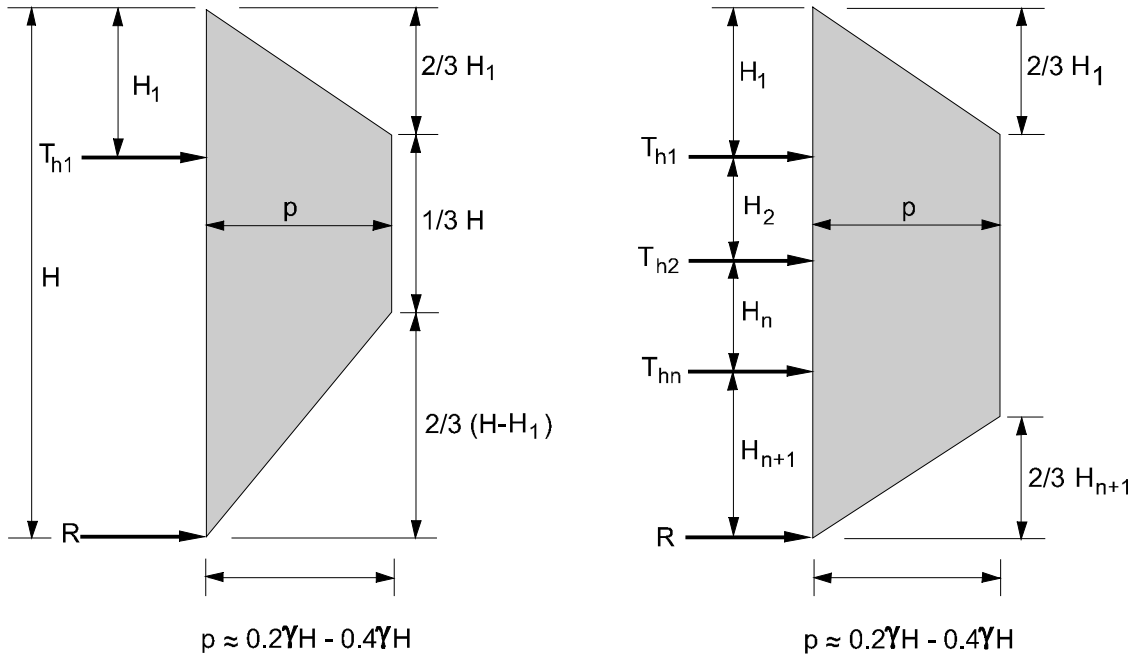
Wall pressure envelopes (after Winter, 1990, “Pacific First Center-Performance of the Tieback Shoring Wall”, Design and Performance of Earth Retaining Structures, Geotechnical Special Publication No. 25, Reprinted by permission of ASCE).
